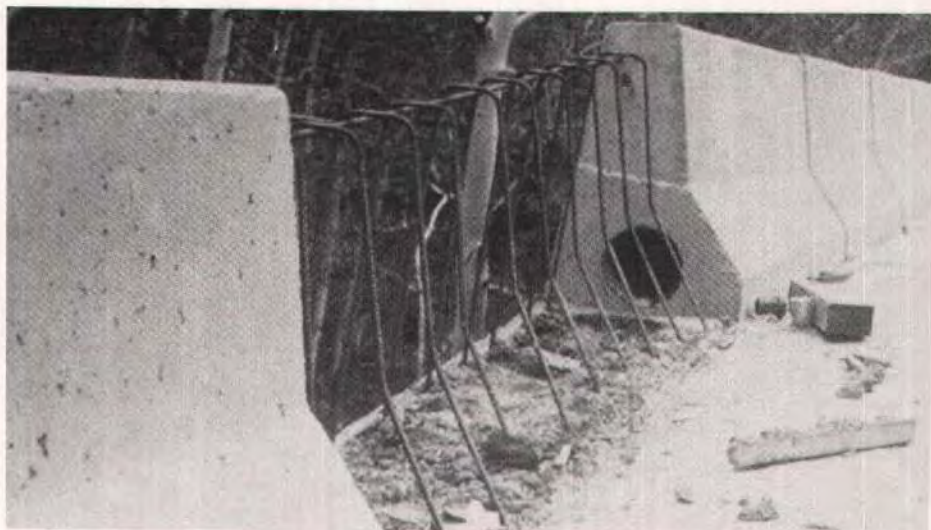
Closure error between two cantilever arms of a precast segmental box girder bridge.
